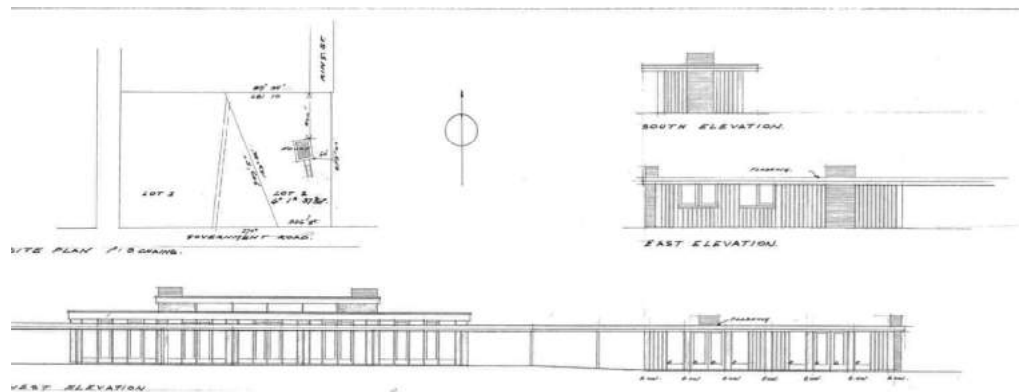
Site and elevation drawings of Knox's own house (constructed c 1962-63) at 2 King Street, Eltham. Source: Alistair Knox Foundation.
